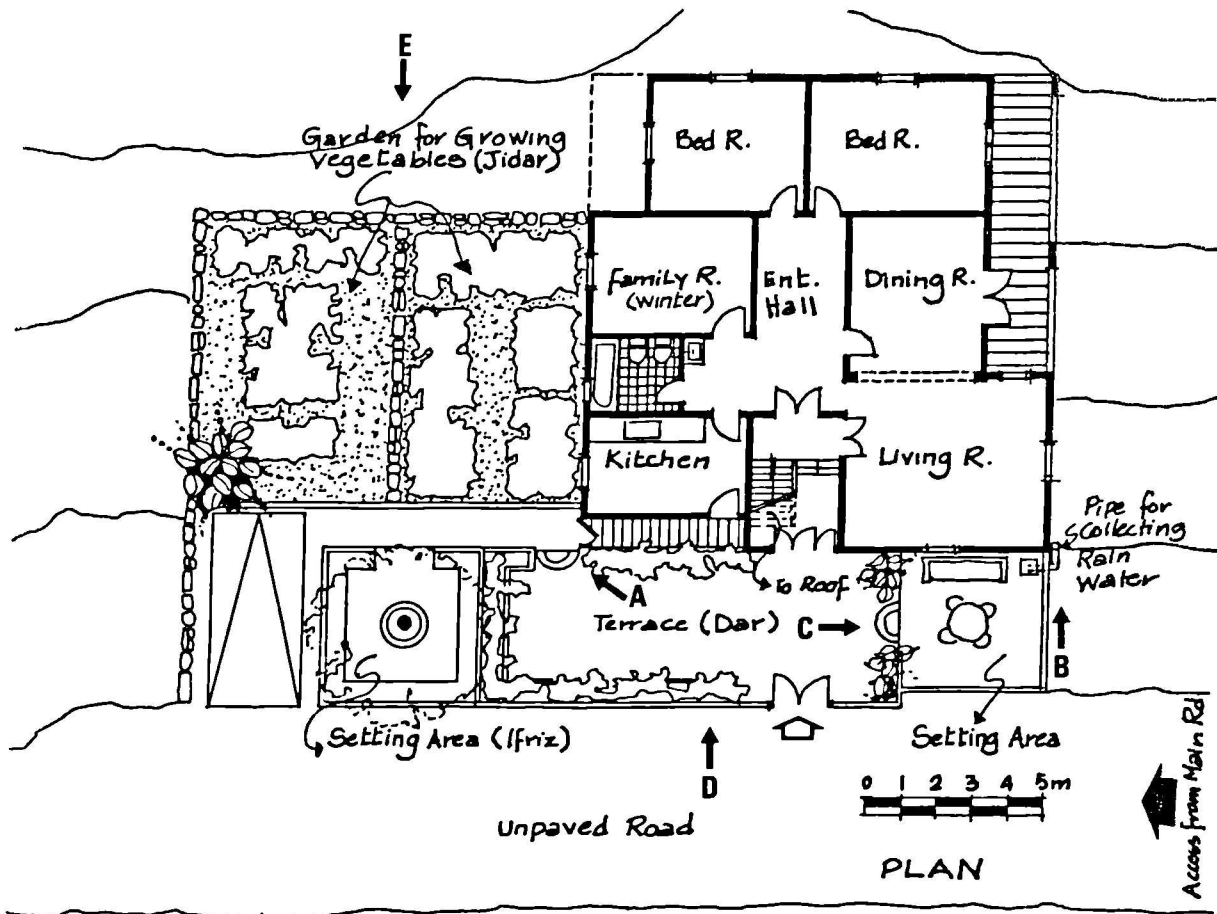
Family No. 3; Plan of Original Dwelling in al-Burjain.
